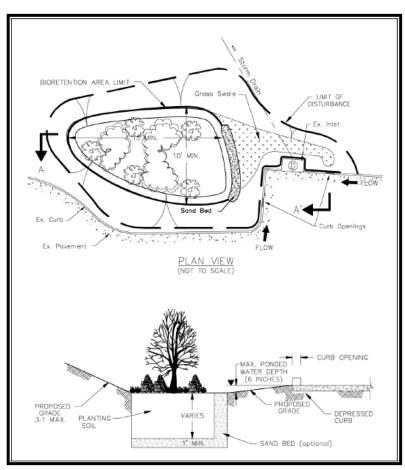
Rain Garden at Edge of Parking Lot, Plan View (Source: Virginia Stormwater Management Handbook)
